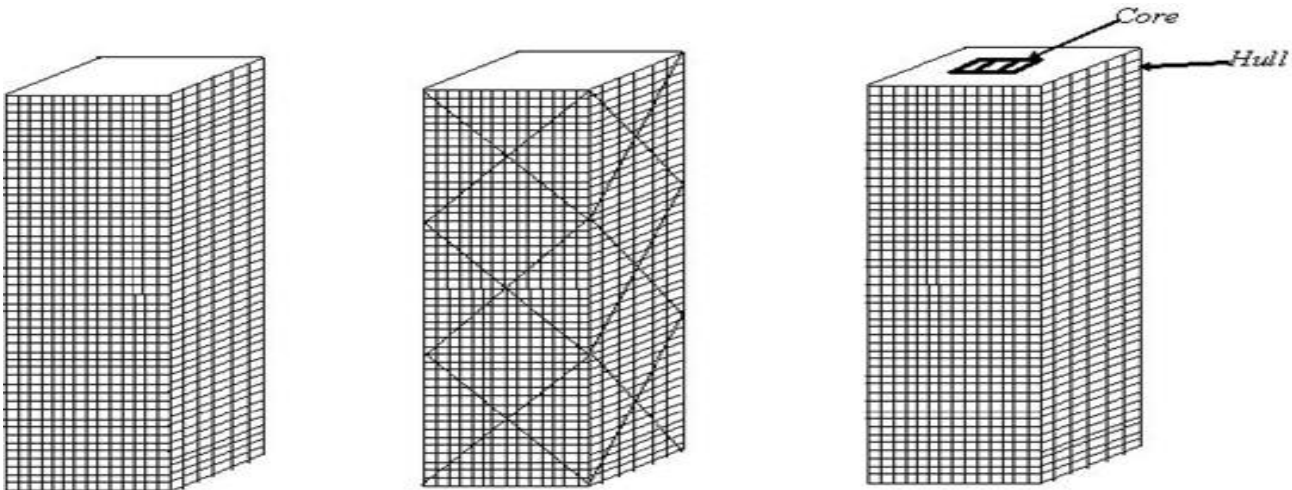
(a) Framed tube (b) Braced Tube (c) Tube in Tube
